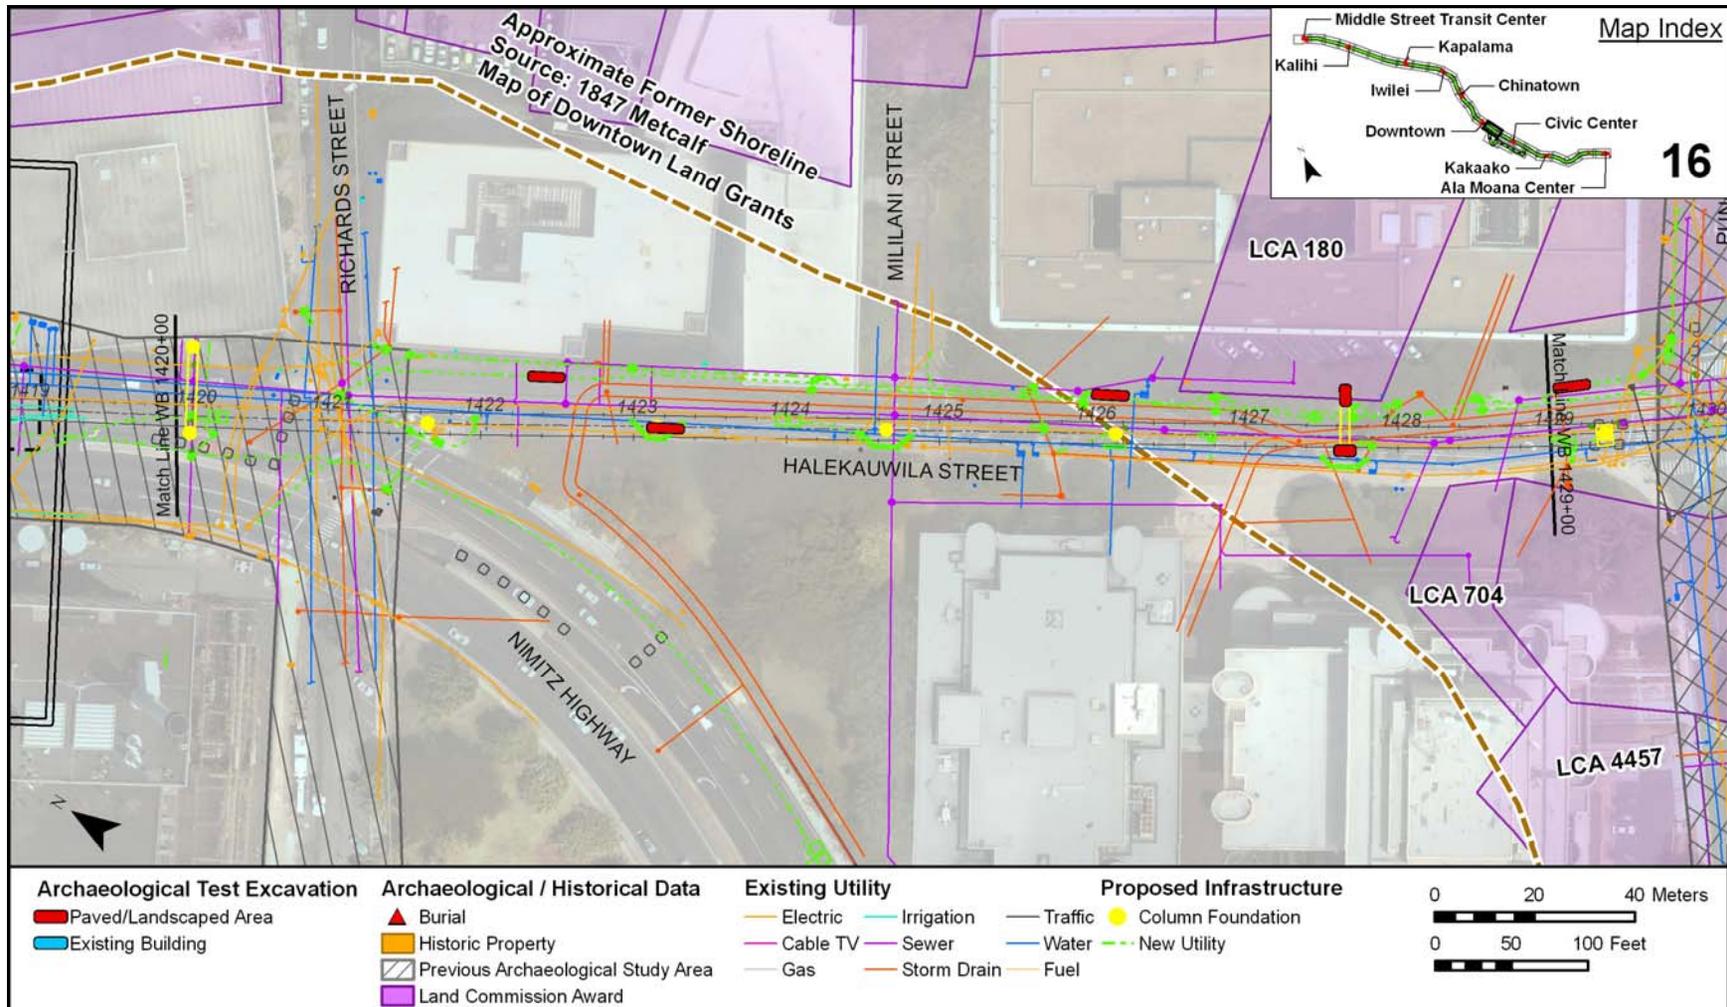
Map 16 Nimitz Highway and Halekauwila Street southeast of the Downtown Station near Mililani Street showing proposed locations for archaeological inventory survey testing including (from northwest to southeast) a 2' by 20' excavation at WB 1423+20 for a guideway column foundation, a 3' by 10' trench at both of the straddle bent foundations at WB 1427+60, and 2' by 20' trenches at the telecommunication manholes at WB 1422+40 and WB 1426+10
